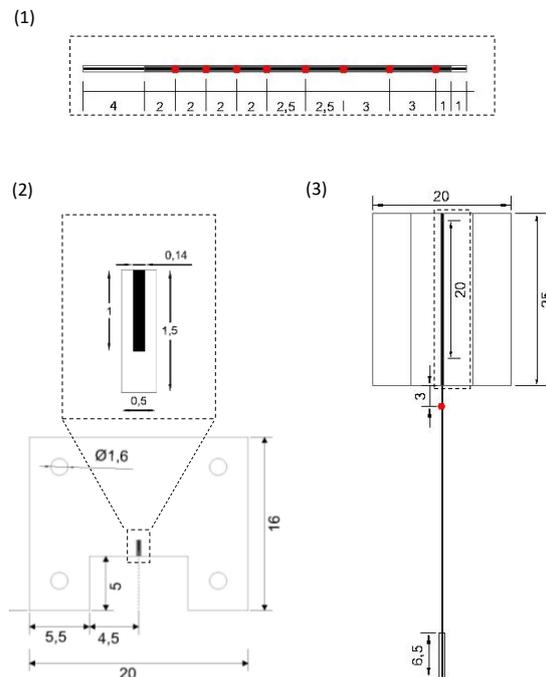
Geometry of test specimens; (1) extensometers inside the bonded length, “ext” series; (2) section geometry; (3) schematic view of all series. Dimensions in cm.
